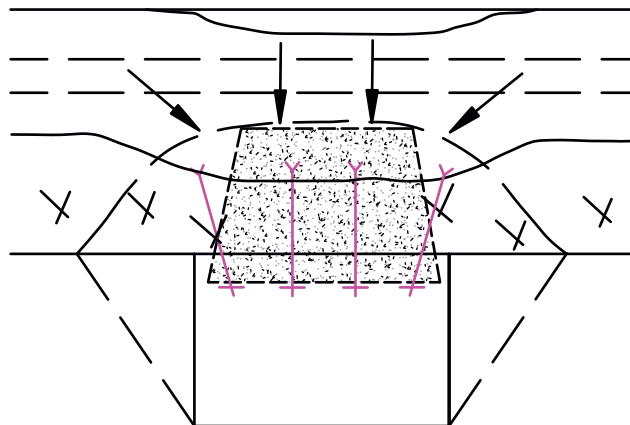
Schematic diagram of the instability of roof rock layer under original anchor support.
